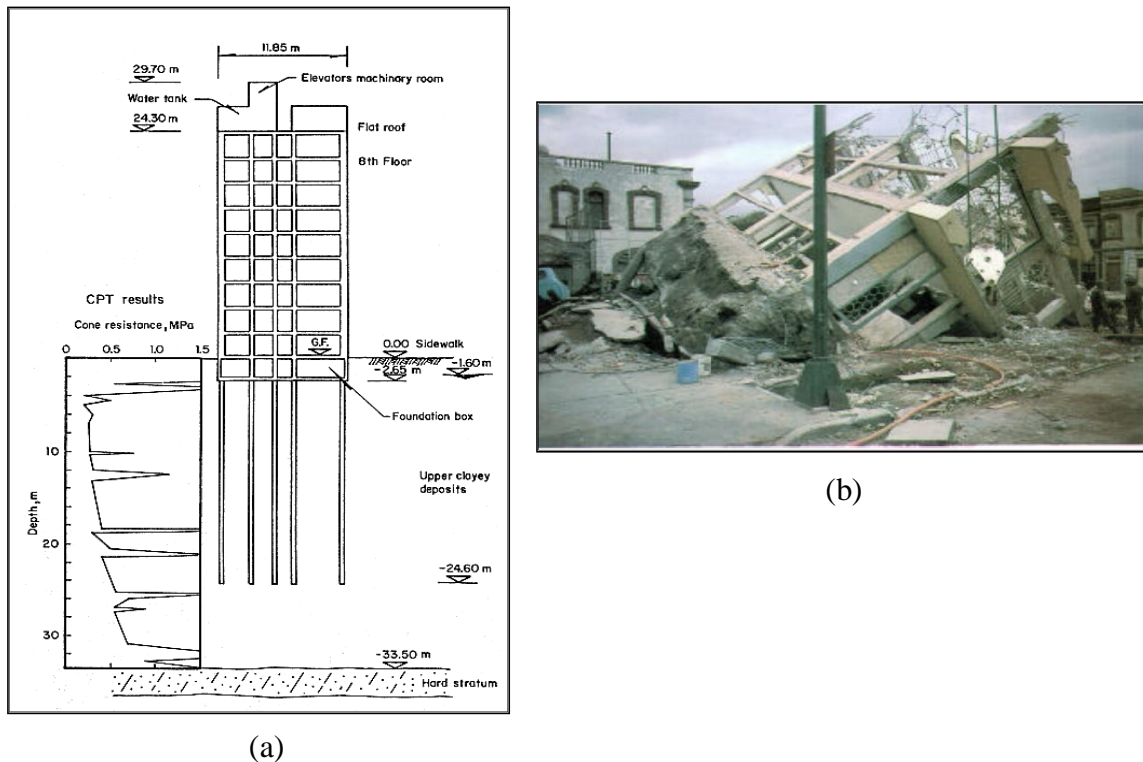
Ten Storey Pile-Supported Building Founded on Soft Soils: a) Elevation Including Geotechnical Conditions, b) Overturned Structure, (Mendoza & Auvinet, 1988)
